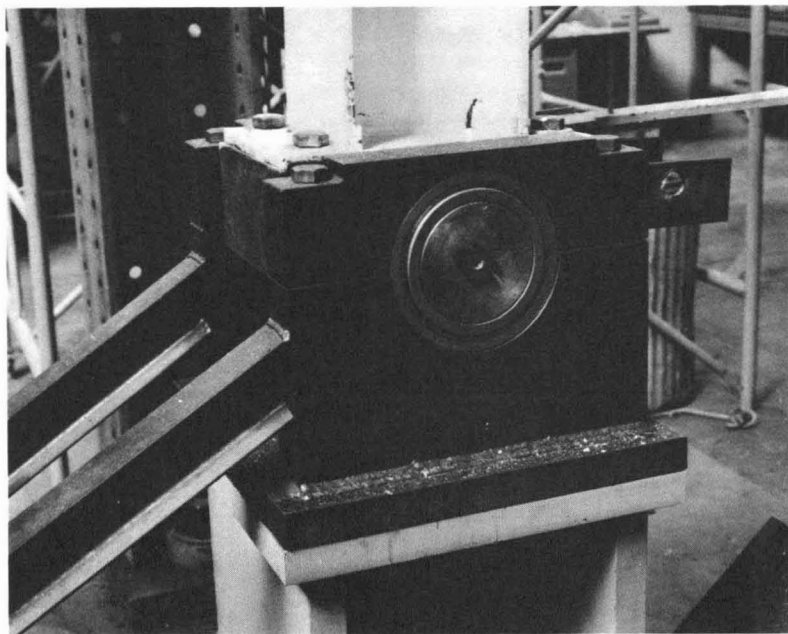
COLUMN HINGE AND HINGE SUPPORT DETAIL
